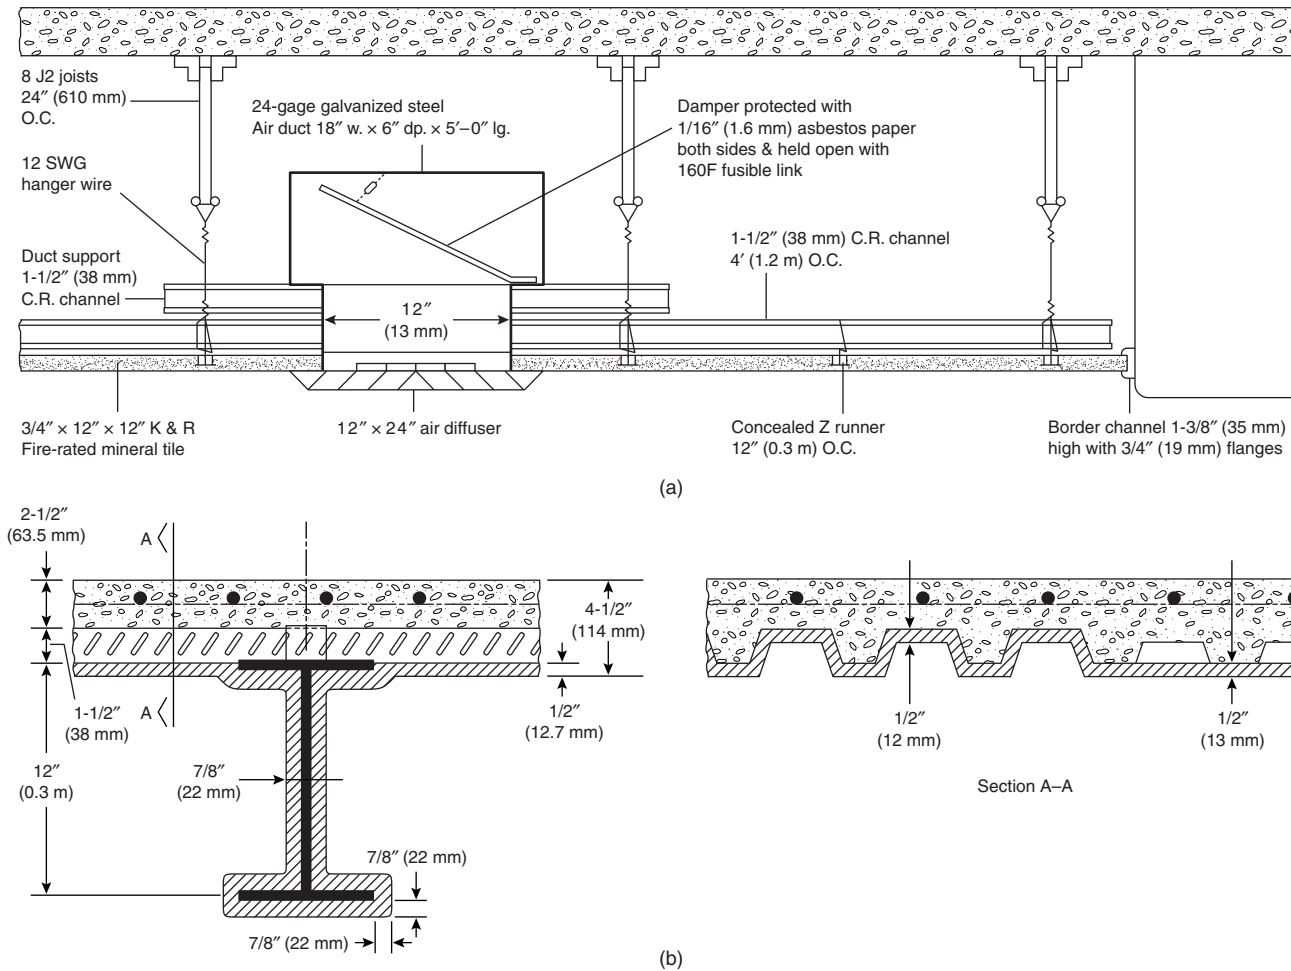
Membrane method of protection,²⁴ (a) Cross-section of a floor-ceiling system with conventional sheet steel fusible-link damper for protecting typical ceiling outlets in galvanized sheet ducts; (b) Sprayed contact fireproofing applied directly to the underside of formed-steel decking and to a supporting steel beam.
